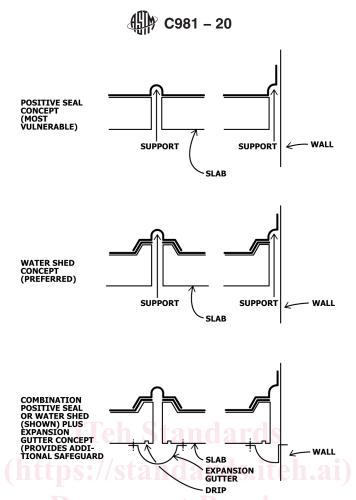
Schematic Expansion Joint Concepts at Membrane Level (see 8.8.7)
